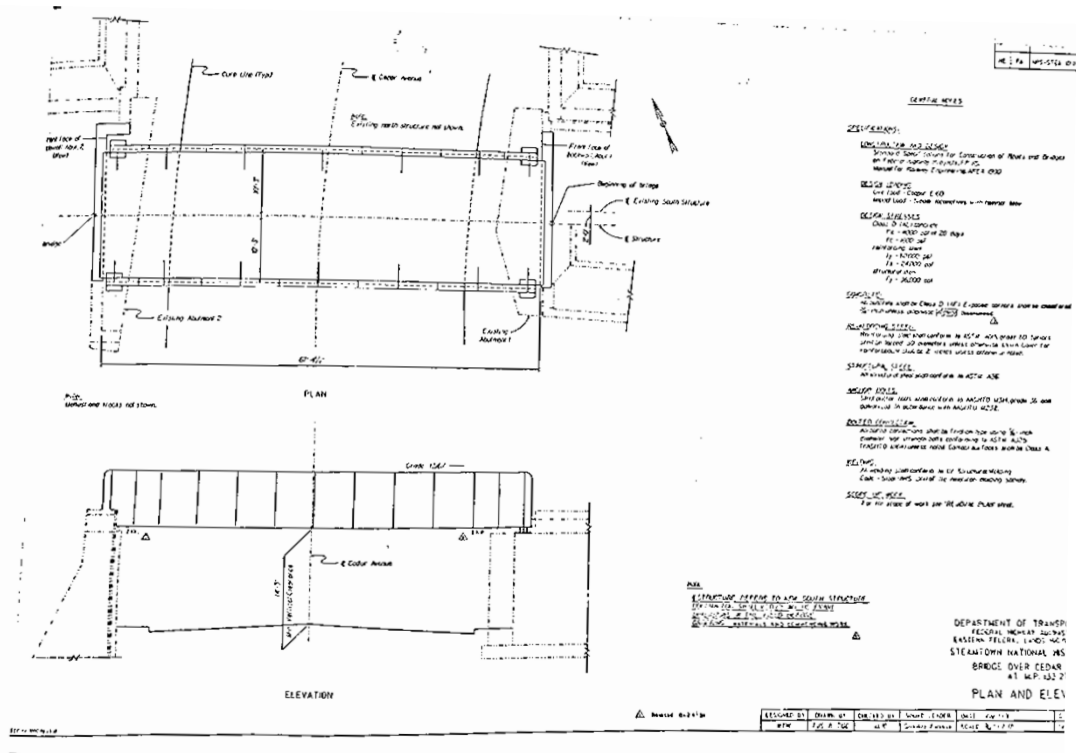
1991 Proposed PennDOT Bridge Plan & Profile
